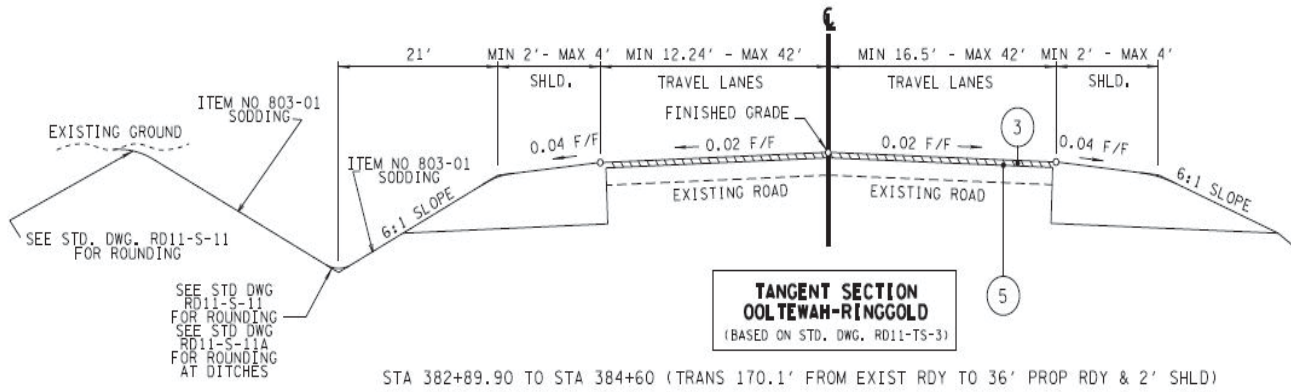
Typical Section of SR-321 north of the intersection with SR-320 near the beginning project limits (05/12/2020 ROW Field Review Plans, Sheet 2B2) (looking from north to south)
